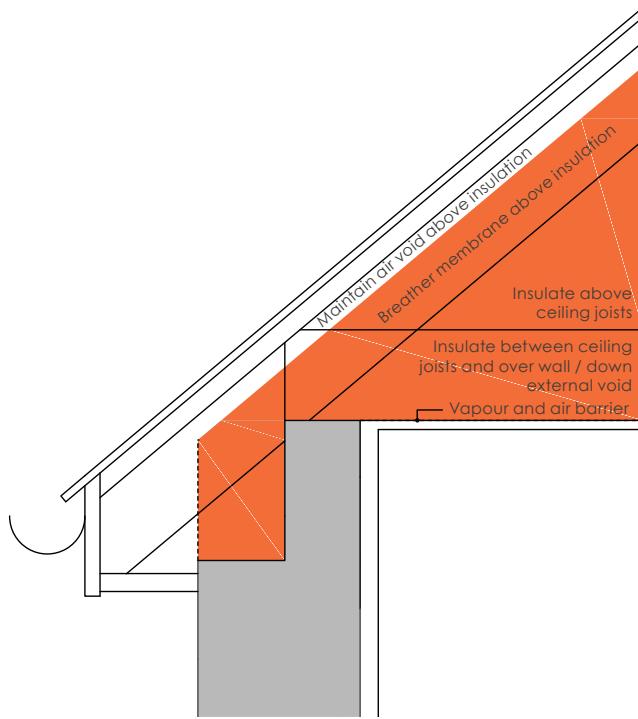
Insulation strategy for cold roof insulated between and above ceiling joists
